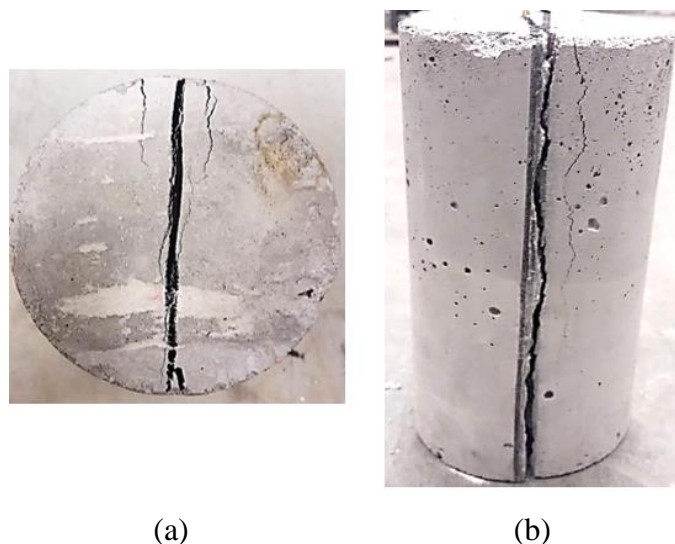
Crack Pattern of Steel Fibre Concrete Cylinder Specimen: (a) Plan View of Concrete Cylinder; (b) Front Elevation of Concrete Cylinder
